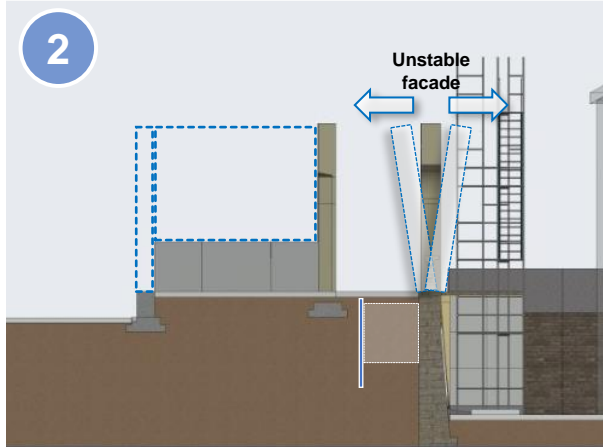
Approach for constructing new concrete structure to stabilise facade facing Block 6
